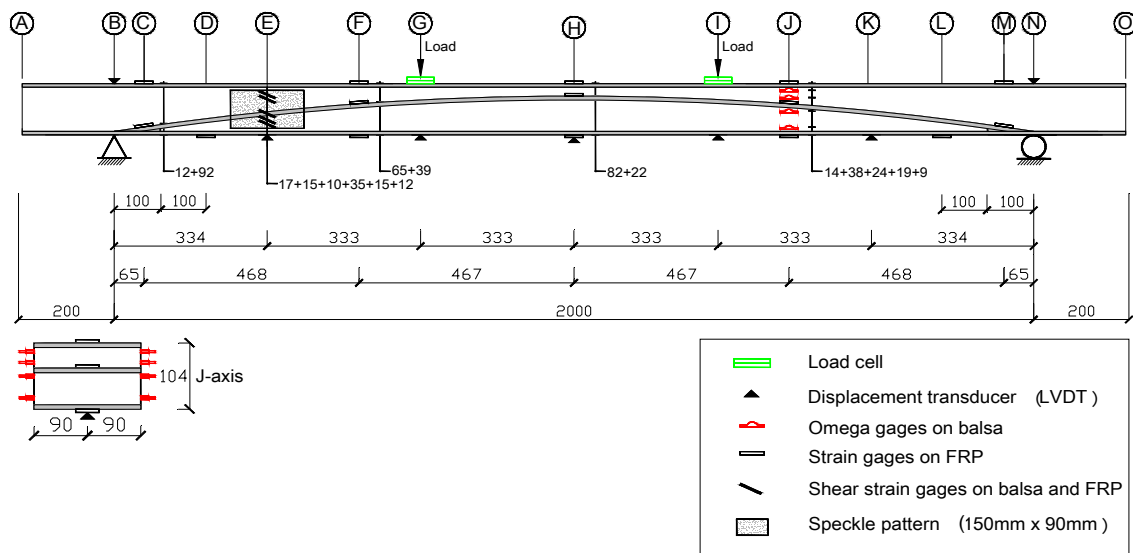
Fully instrumented A-G-2 beam with cross section at J-axis
